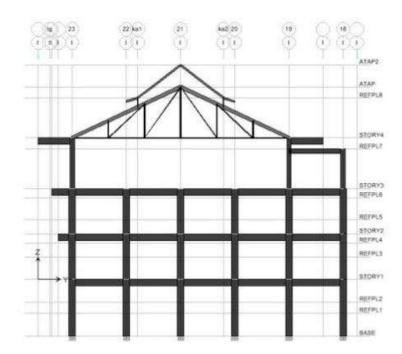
Modified roof structure of Auditorium (Wibowo et al. 2007)
